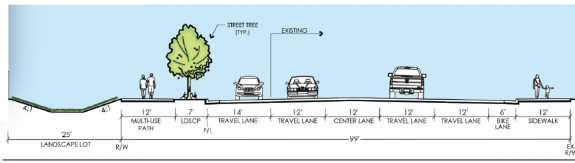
SERVICE ROAD (WEST OF HIGH SCHOOL SITE)
